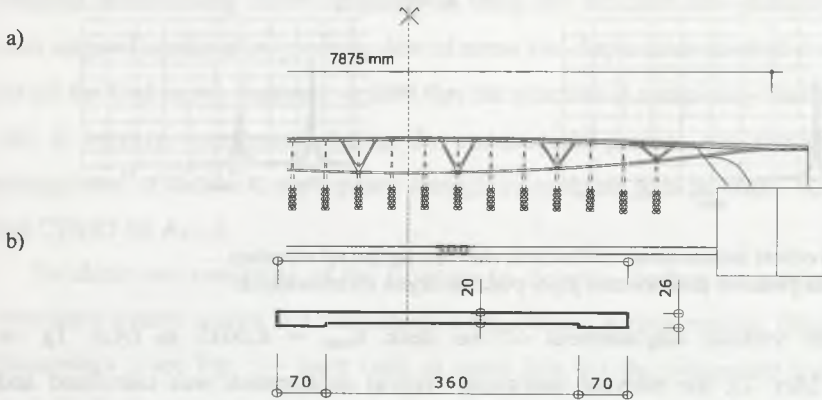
a) Arrangement of the model for testing of maximum load carrying capacity, b) simplified cross-section of the concrete deck members
